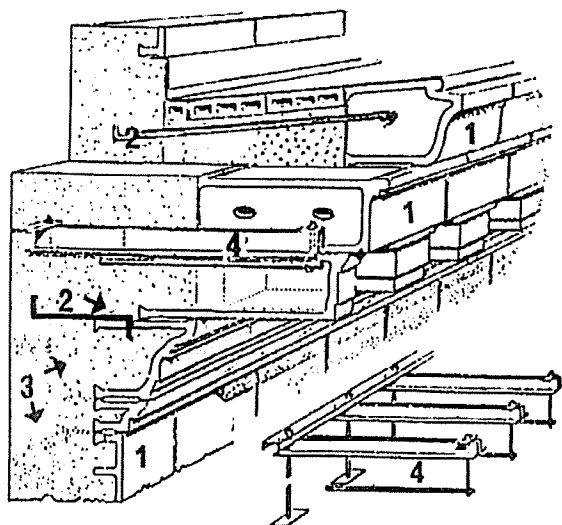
Typical Construction Detail of Glazed Architectural Terra-Cotta Ornament. Construction detailing was often complex. The terra-cotta units (1) which were laid in mortar were fitted with holes or slots to receive the metal anchors (2) (often called "Z" straps or "light iron") which were often fitted directly to the building frame. Masonry backfill (3) (either brick or poured cement) was laid between the terra-cotta units, with the building frame encasing the metal anchor. Overhanging or protruding elements were further secured by metal dowels or outriggers (4). (Detail, Architectural Terra Cotta, Charles E. White, Jr., 1920)
